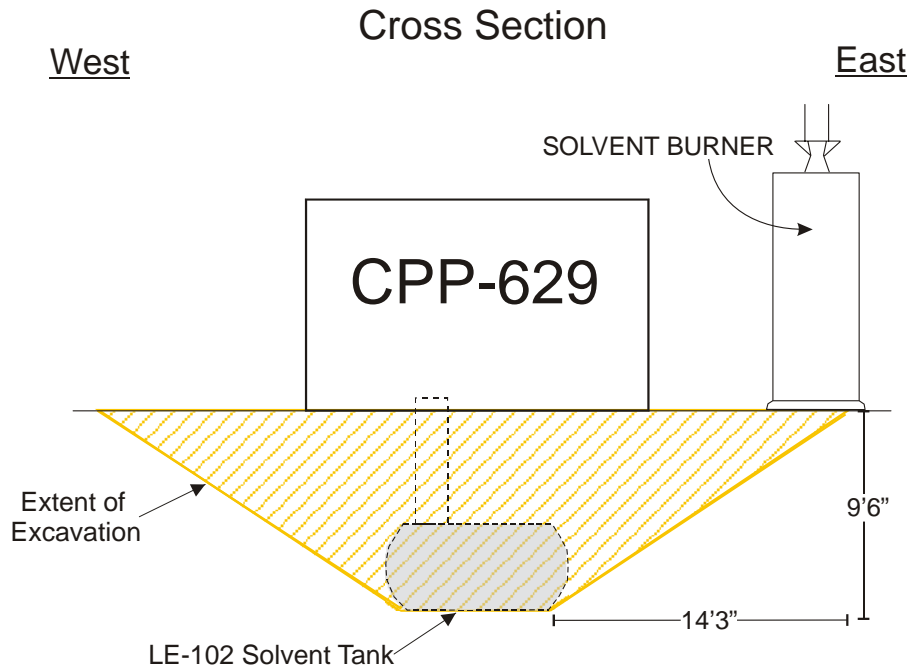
Cross section showing the general shape of the 1983 excavation to remove solvent tank.
